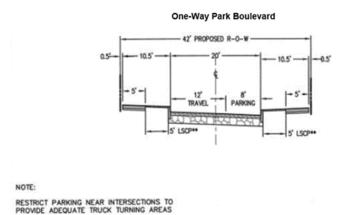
B. Juniper Ridge Overlay Zone Street Cross-Sections
